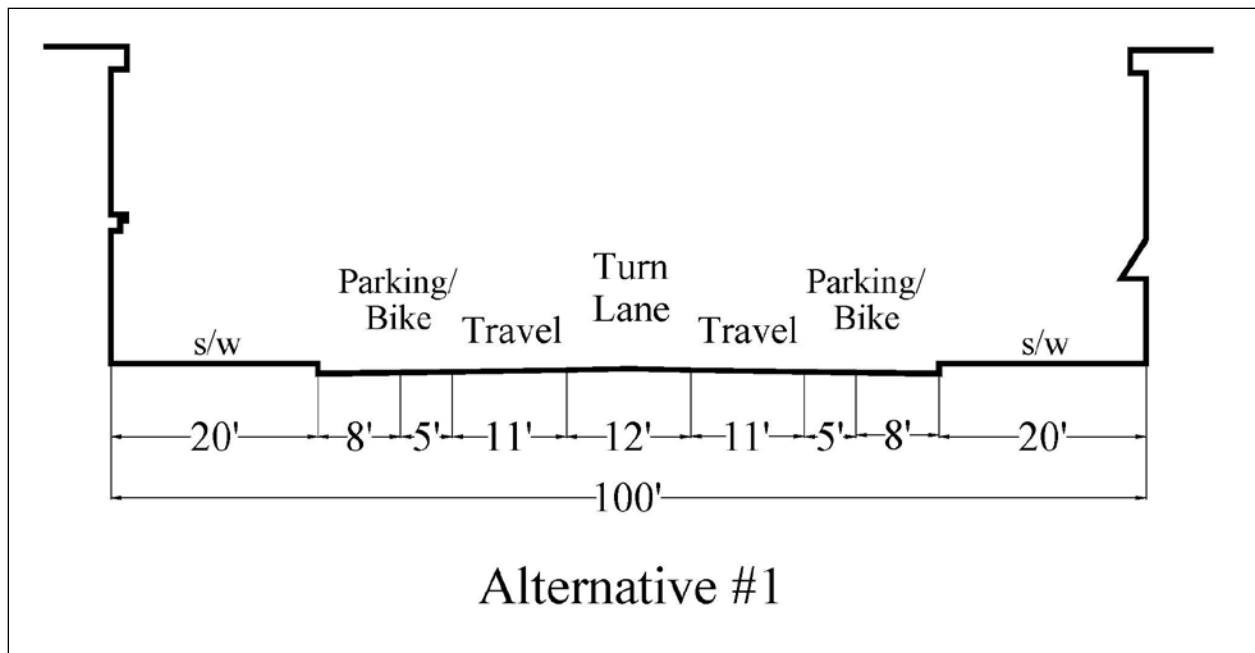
Alternative street cross-section. Source: Kimley-Horn and Associates, Inc.
